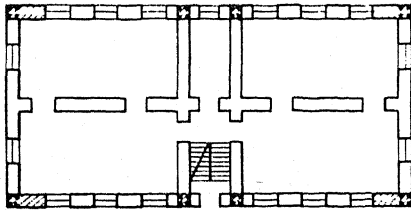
STRENGTHENING OF NON-THROUGH WALLS OF STAIRCASE
